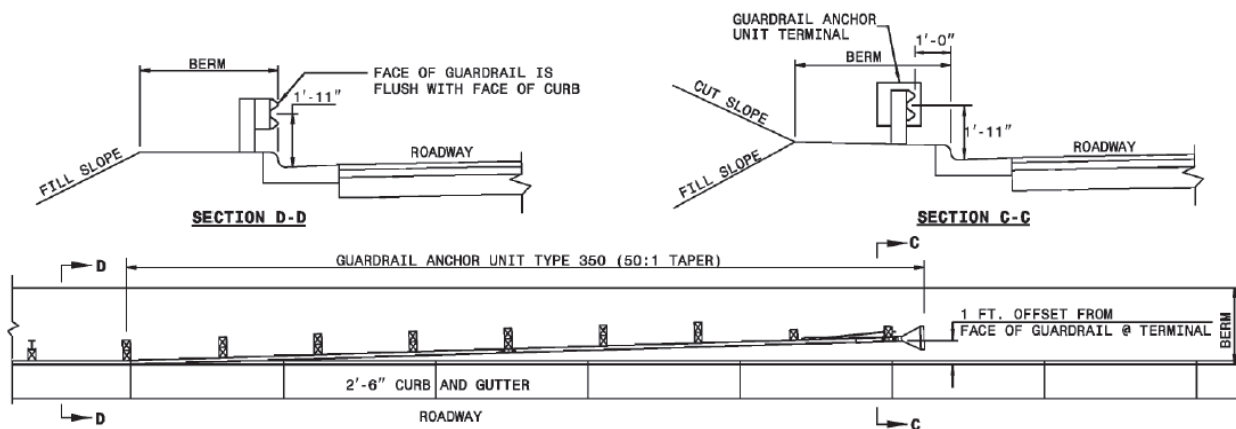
Placement of guardrail at face of curb (NCDOT Standard Drawing 862.01).
